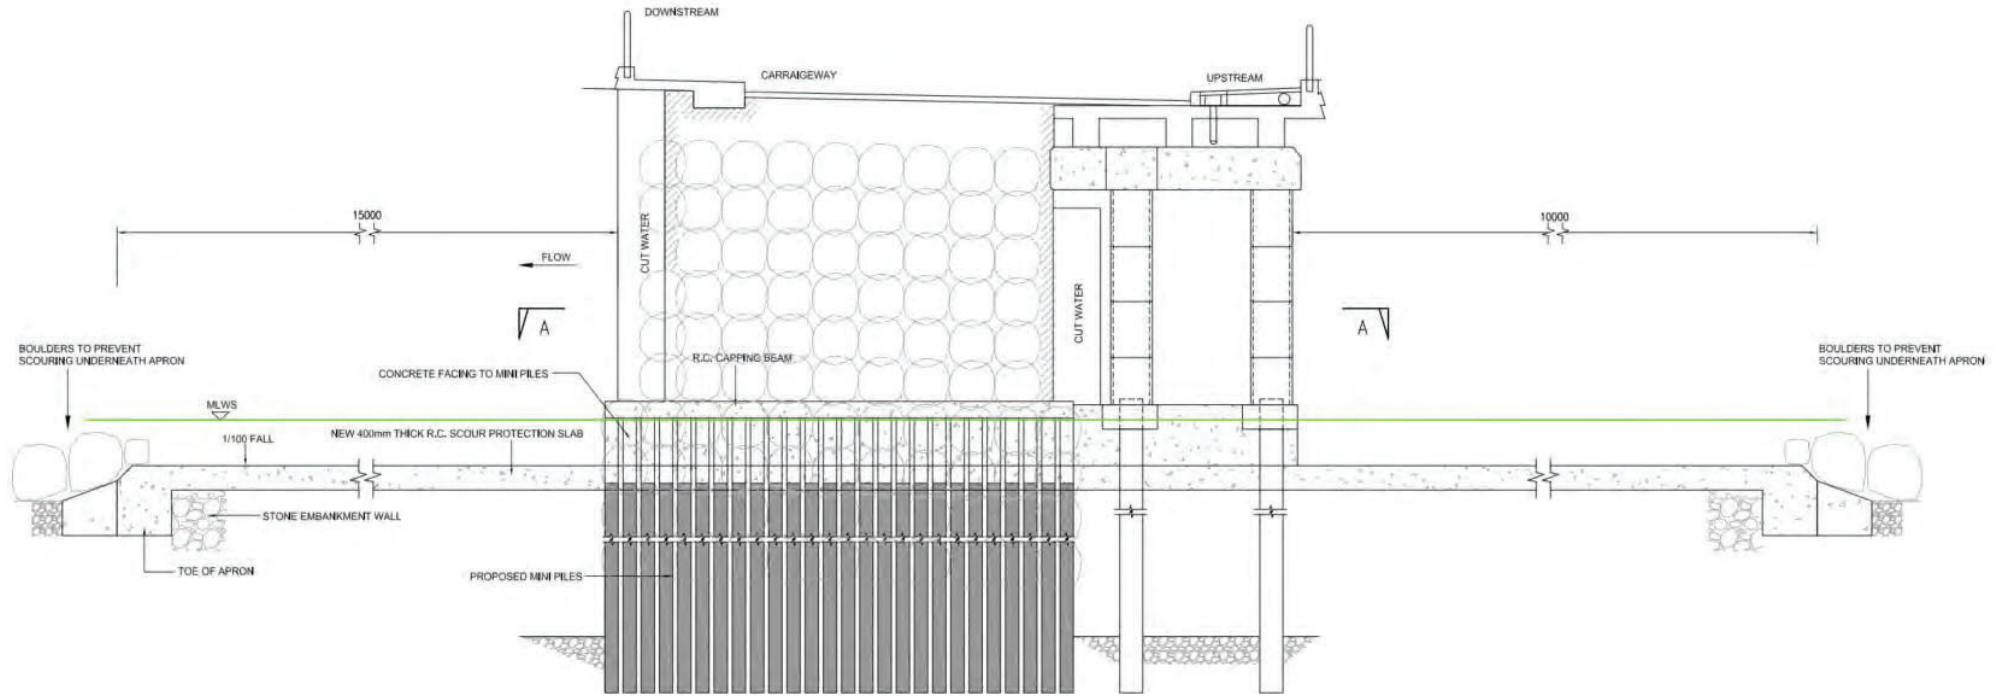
Scour Protection detail (extracted from Drawing No. 1008. Refer to Drawing Nos. 1006-1010 for details of scour protection) Not to scale
